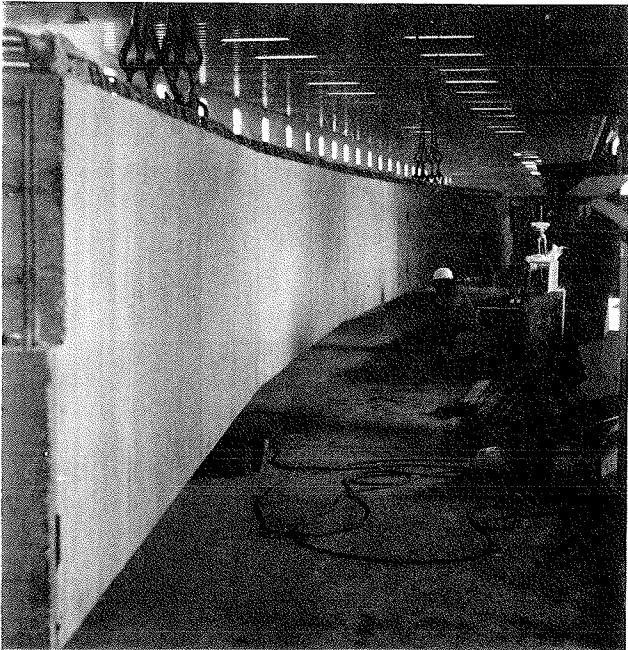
Completed girder being prepared for shipment to bridge site.
